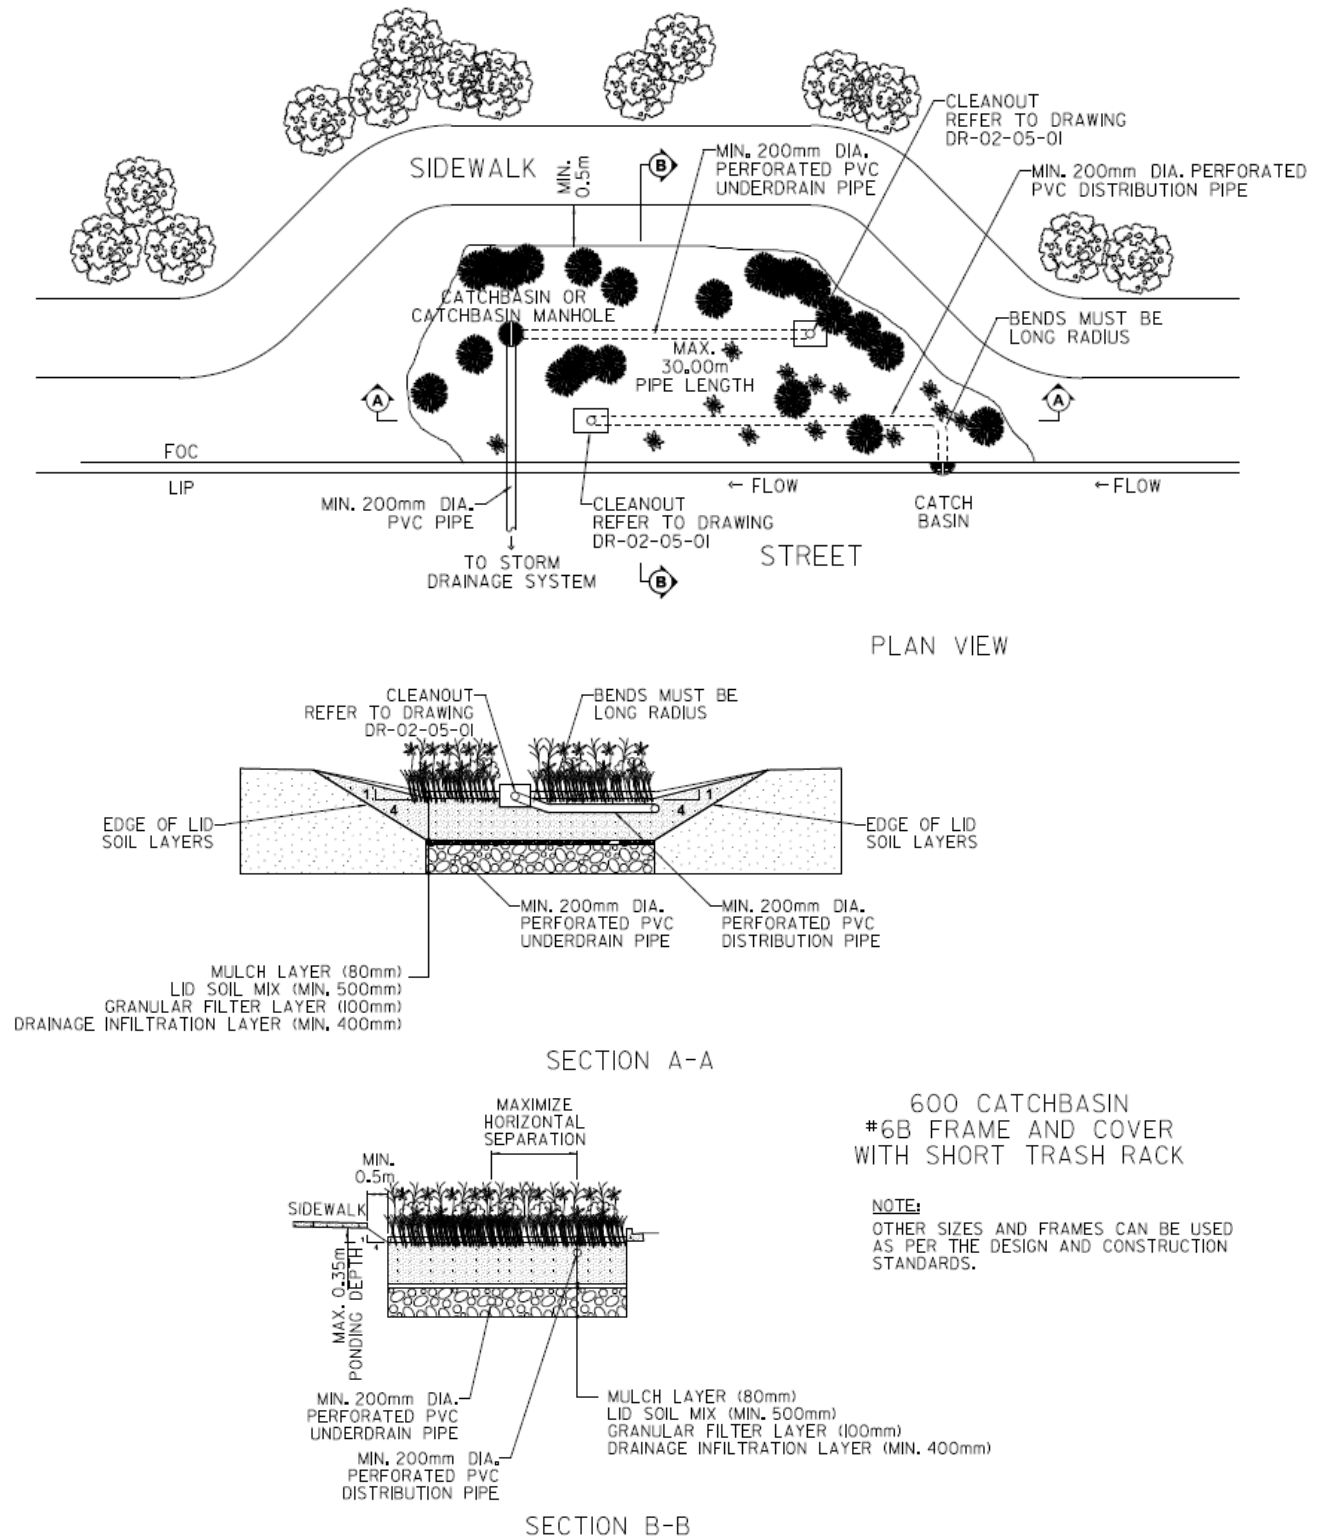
Bioretention Basin with Catch Basin Inlet Plan View and Cross Sections
